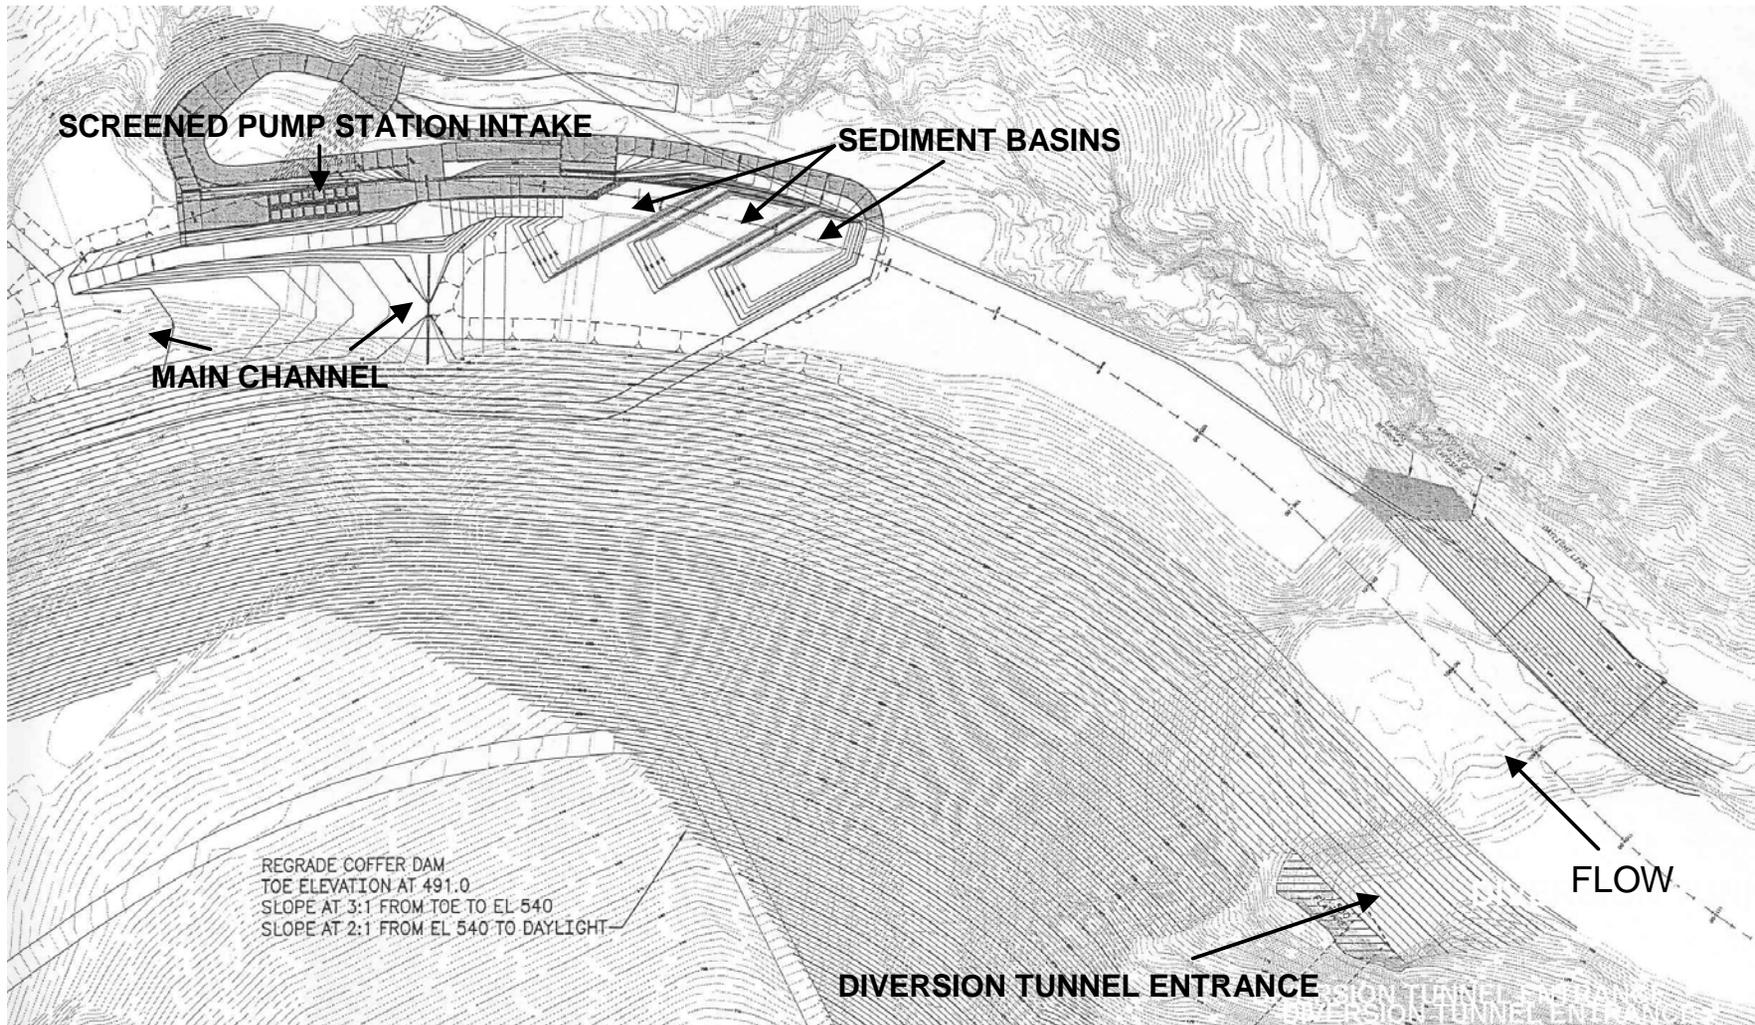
Plan view of the PCWA American River project showing the diversion tunnel entrance location underneath projected fill, cofferdam, and initial pumping station design.
